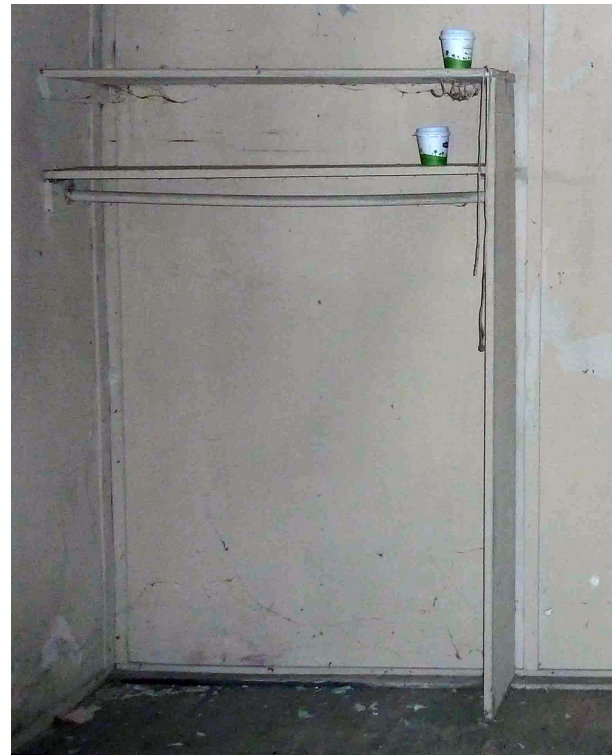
View of shelves and hanger rod built in southeast corner of Room 101.
